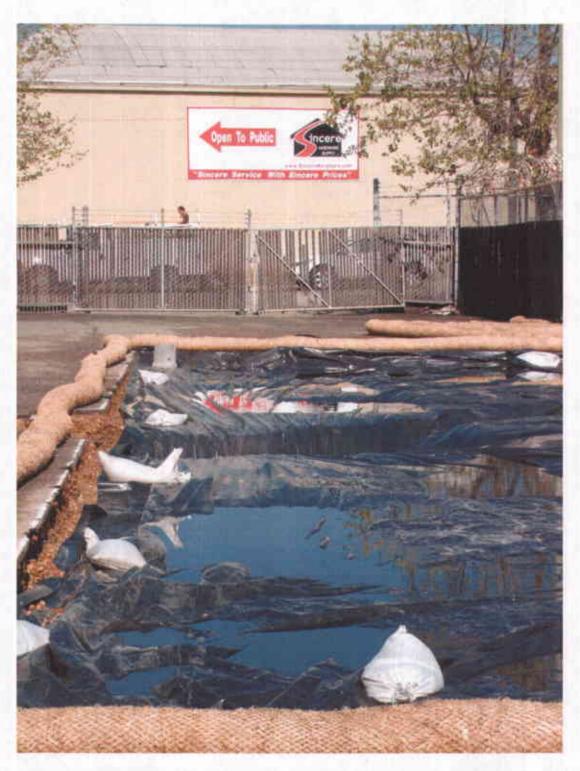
(4/20/2007)— A view of the area being excavated for building pad construction, note the accumulated rainwater on the plastic sheeting covering the equipment pad excavation.
